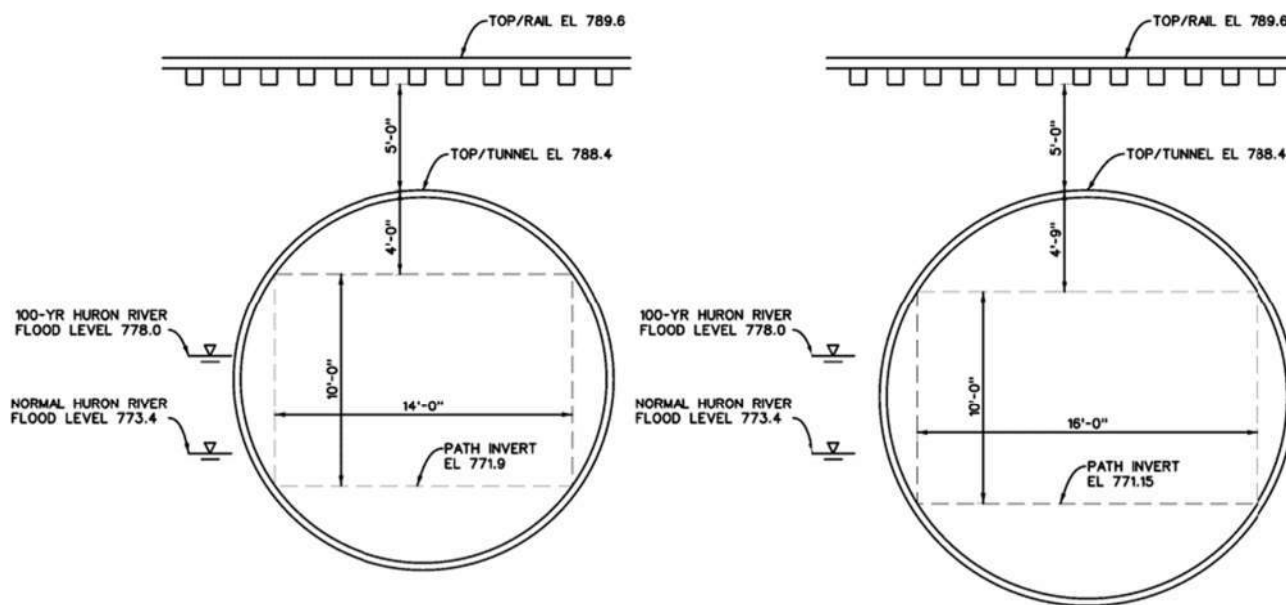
Tunnel Liner Plate structure: 14-ft horizontal clearance (left) and 16-ft horizontal clearance (right)
